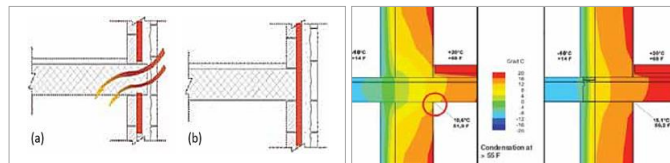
(Left) (a); Thermal bridge at the wall-floor connection, (b); Good insulation without thermal bridge. (Right); Temperature flow at the wall-floor connection
